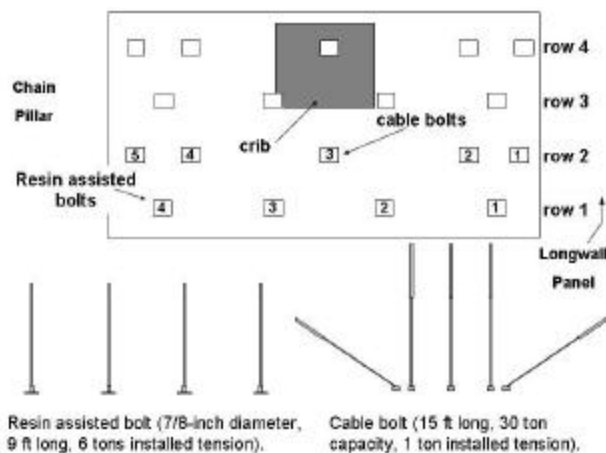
Plan view of the sub-model and cross-section of the installed bolting systems.
